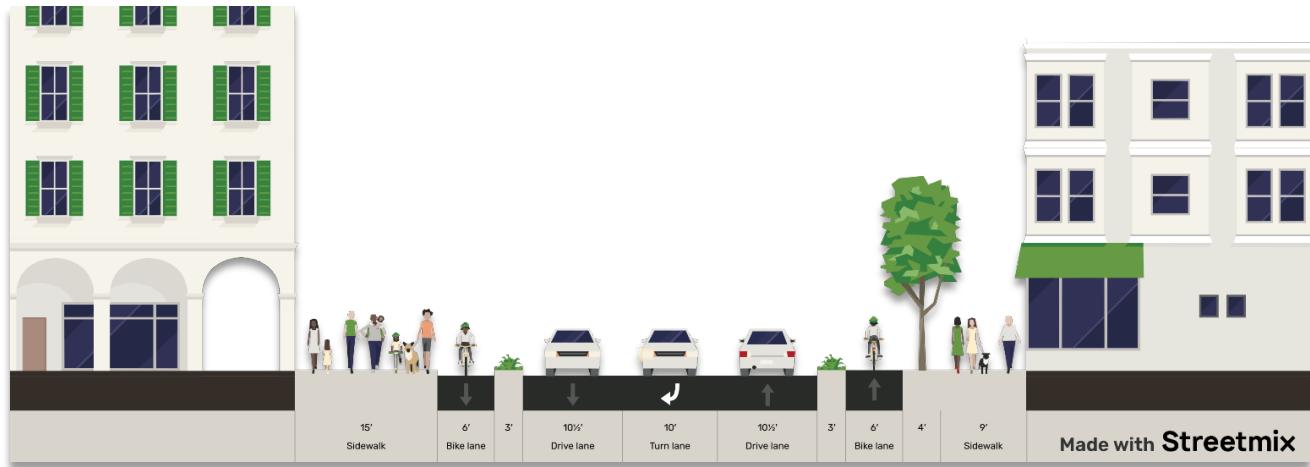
Glen Avenue – Catherine Street to Ann Street, Alternative with Separated Bike Lanes, ROW
